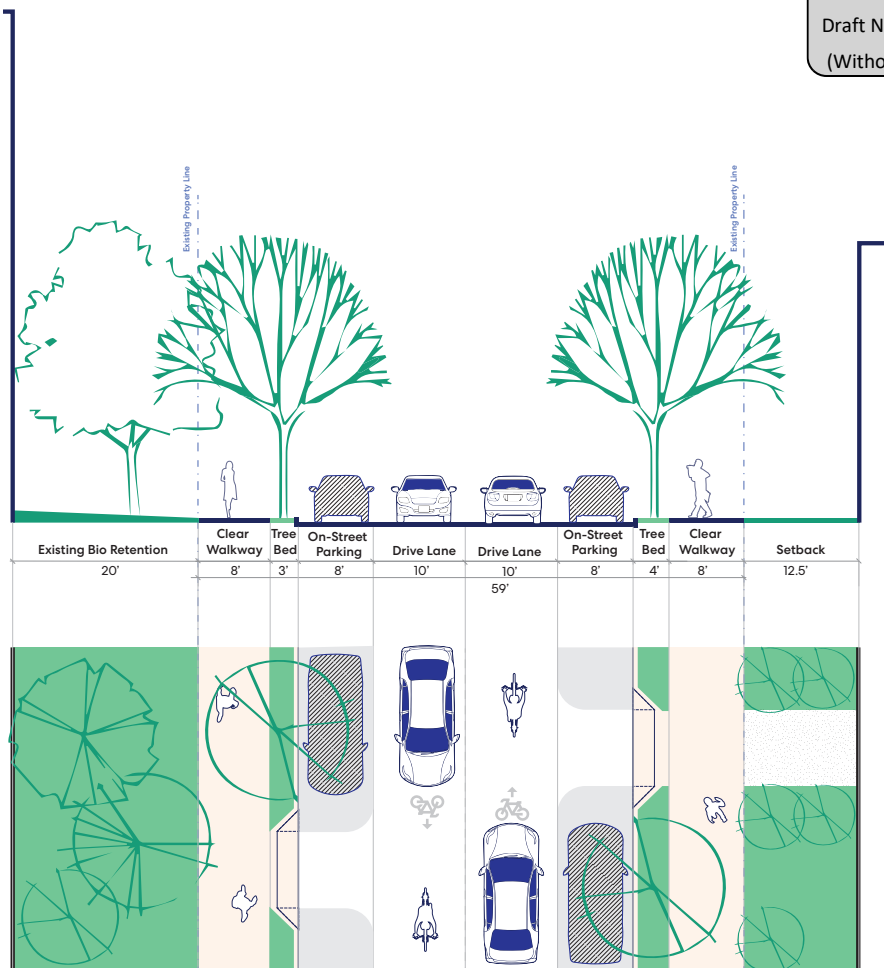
Typical Olive Avenue section between Park Boulevard and Ash Street
